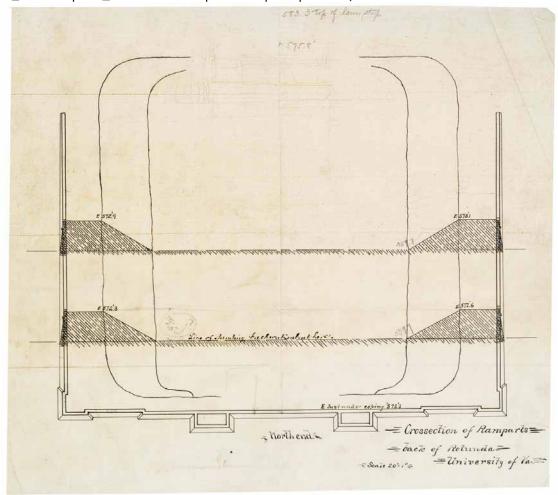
This plan and cross section of the ramparts shows the sunken Rotunda courtyard proposed by McKim, Mead & White around 1896. Courtesy, The New-York Historical Society. (R-JAV-NYHS-MMW-c1896-87777d_UVA_RampartsElev_MMW-M-2-Section and Plan of Ramparts.JPG)
